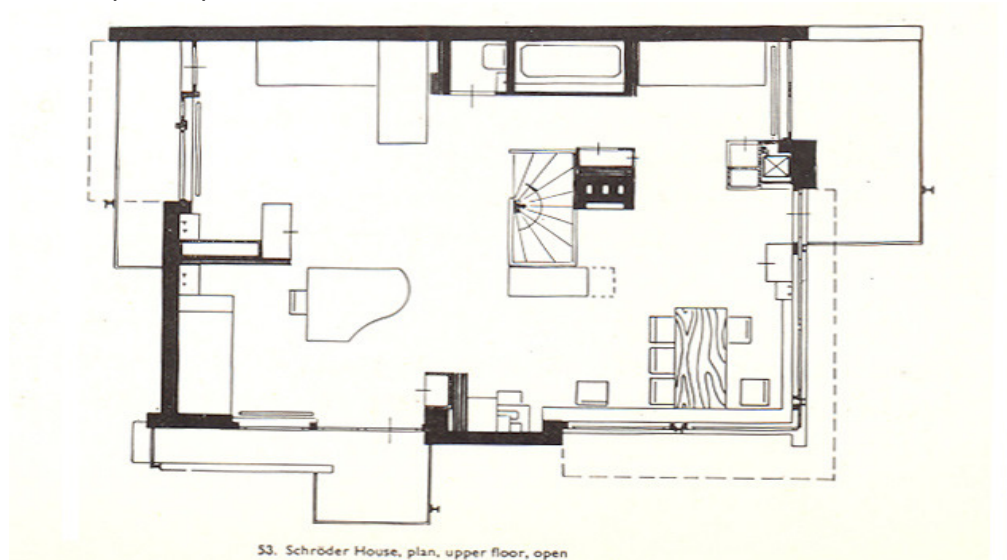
Schroder House plan, Upper floor – Open layout
